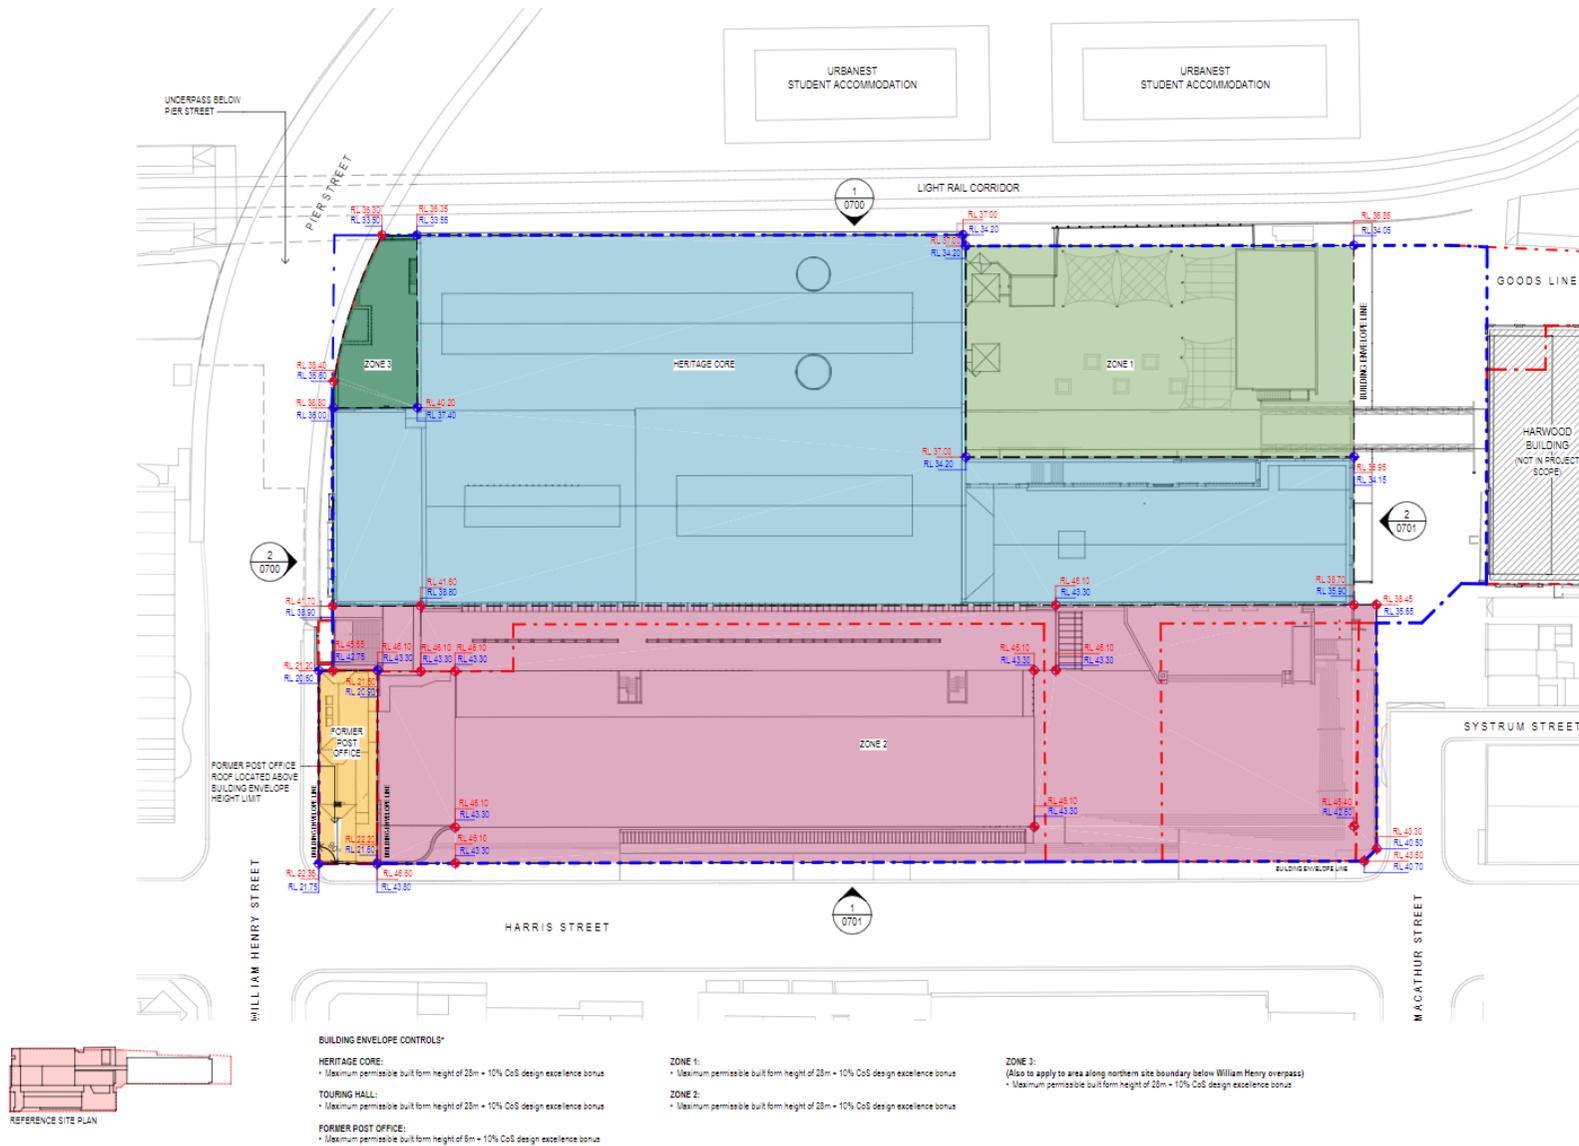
Ultimo Powerhouse- Building Envelope Plan (Source: John Wardle Architects 2022)
